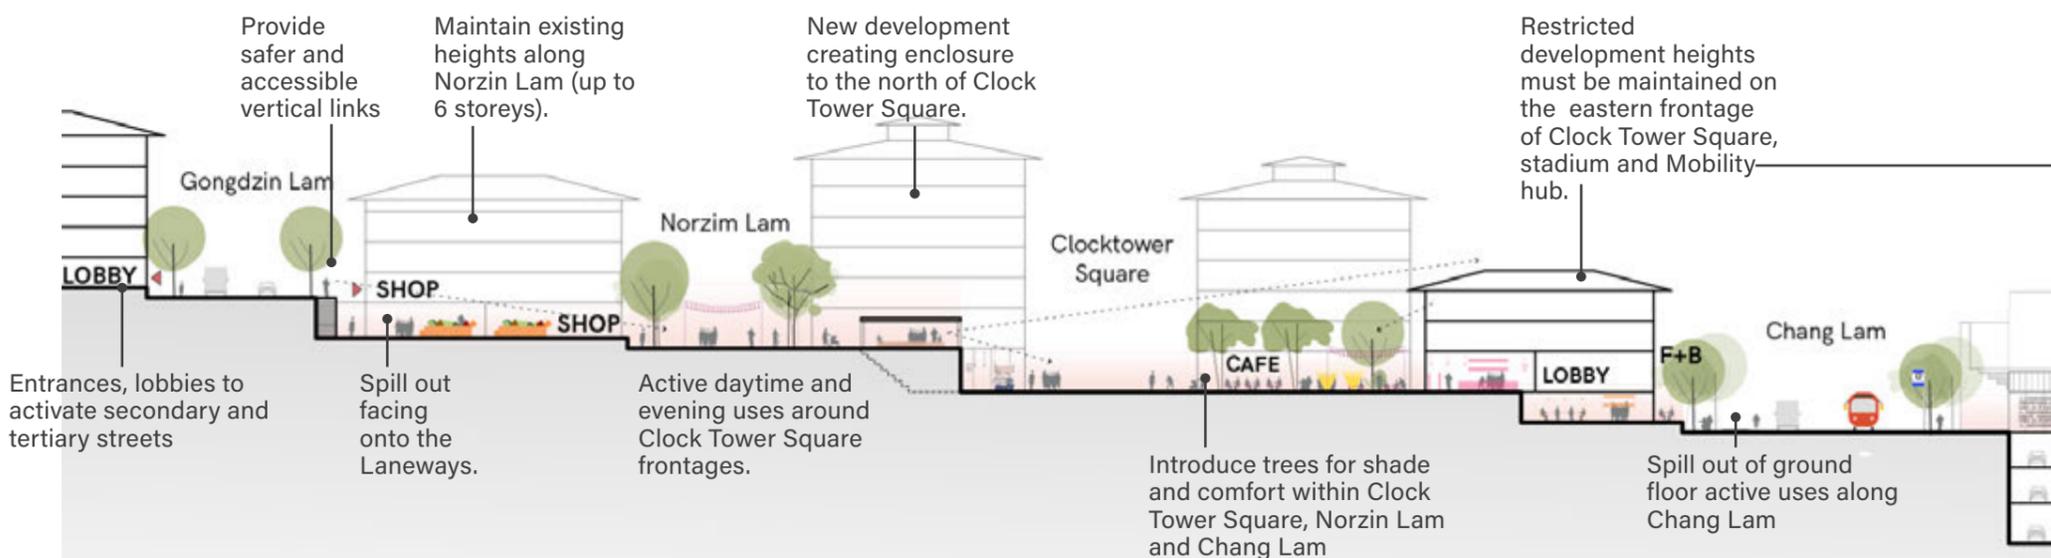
Section through Norzin Lam, Clock Tower Square, Chang Lam and Centenary Park
